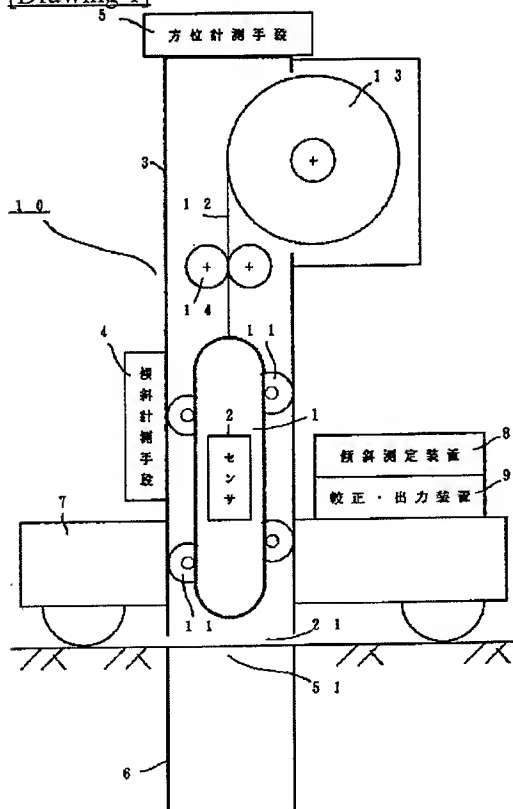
It is a figure explaining the system-of-measurement calibration device and hole bend measuring method concerning this invention.
